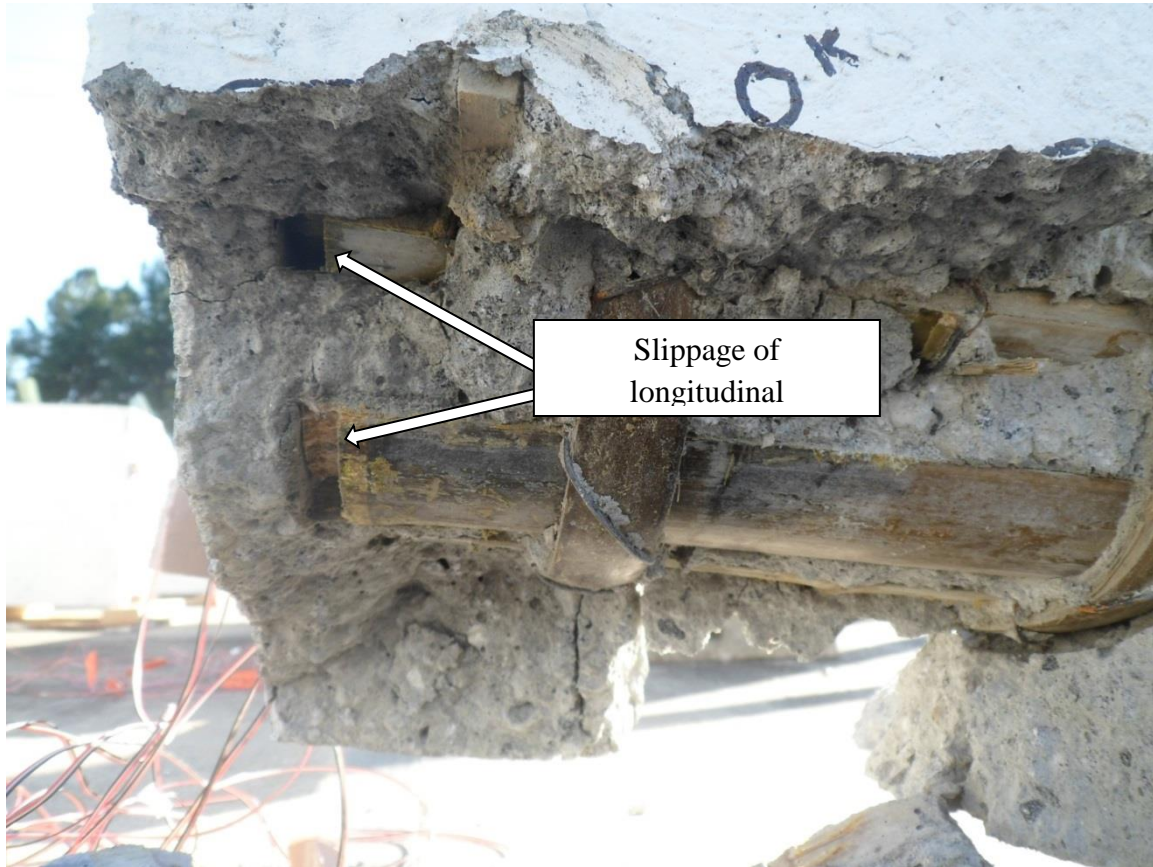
Longitudinal reinforcement slippage near beam end of beam S2
